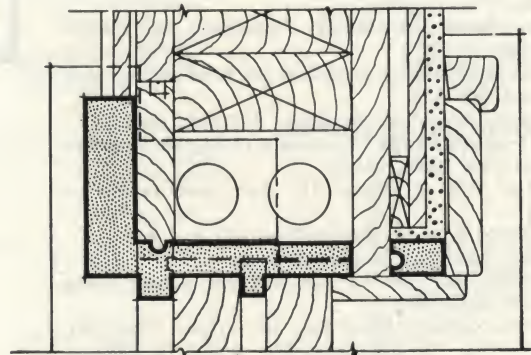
Standard thickness sheathing extended over the edge of pulley stile with furring, lath and plaster inside. Inside liner placed on edge to make required jamb width.
